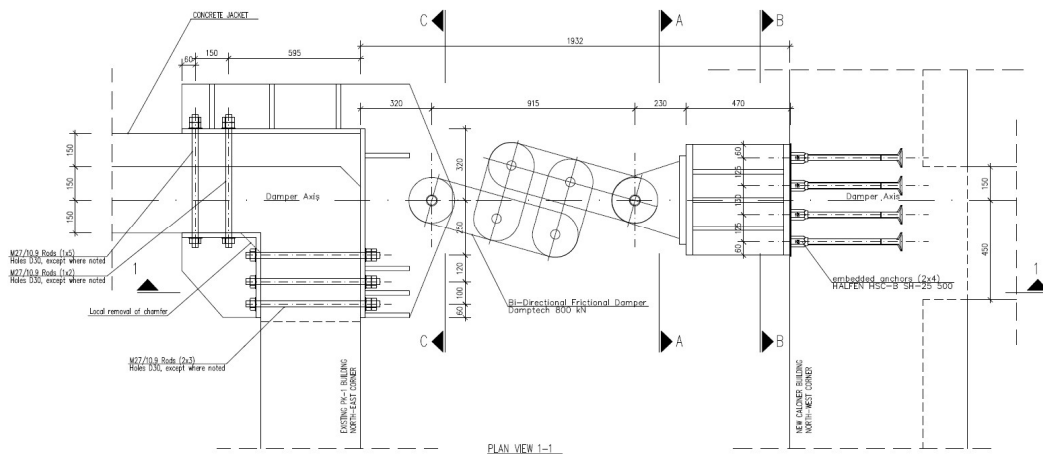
Connection of damper to structure. Existing structure (left) and new structure (right).
